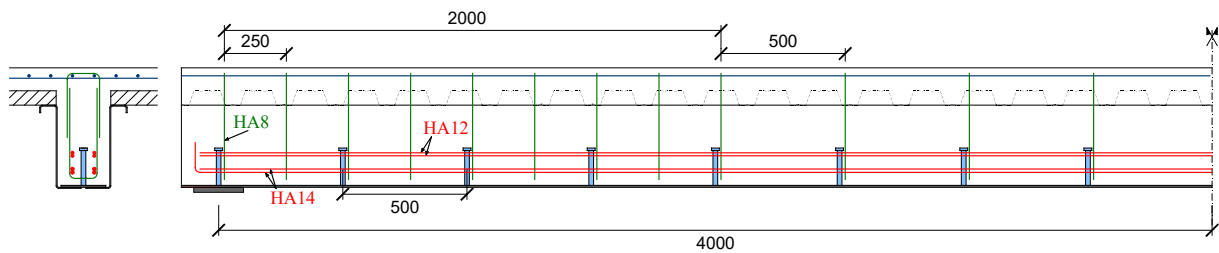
Representation of the reinforcement bars in the composite beam studied
